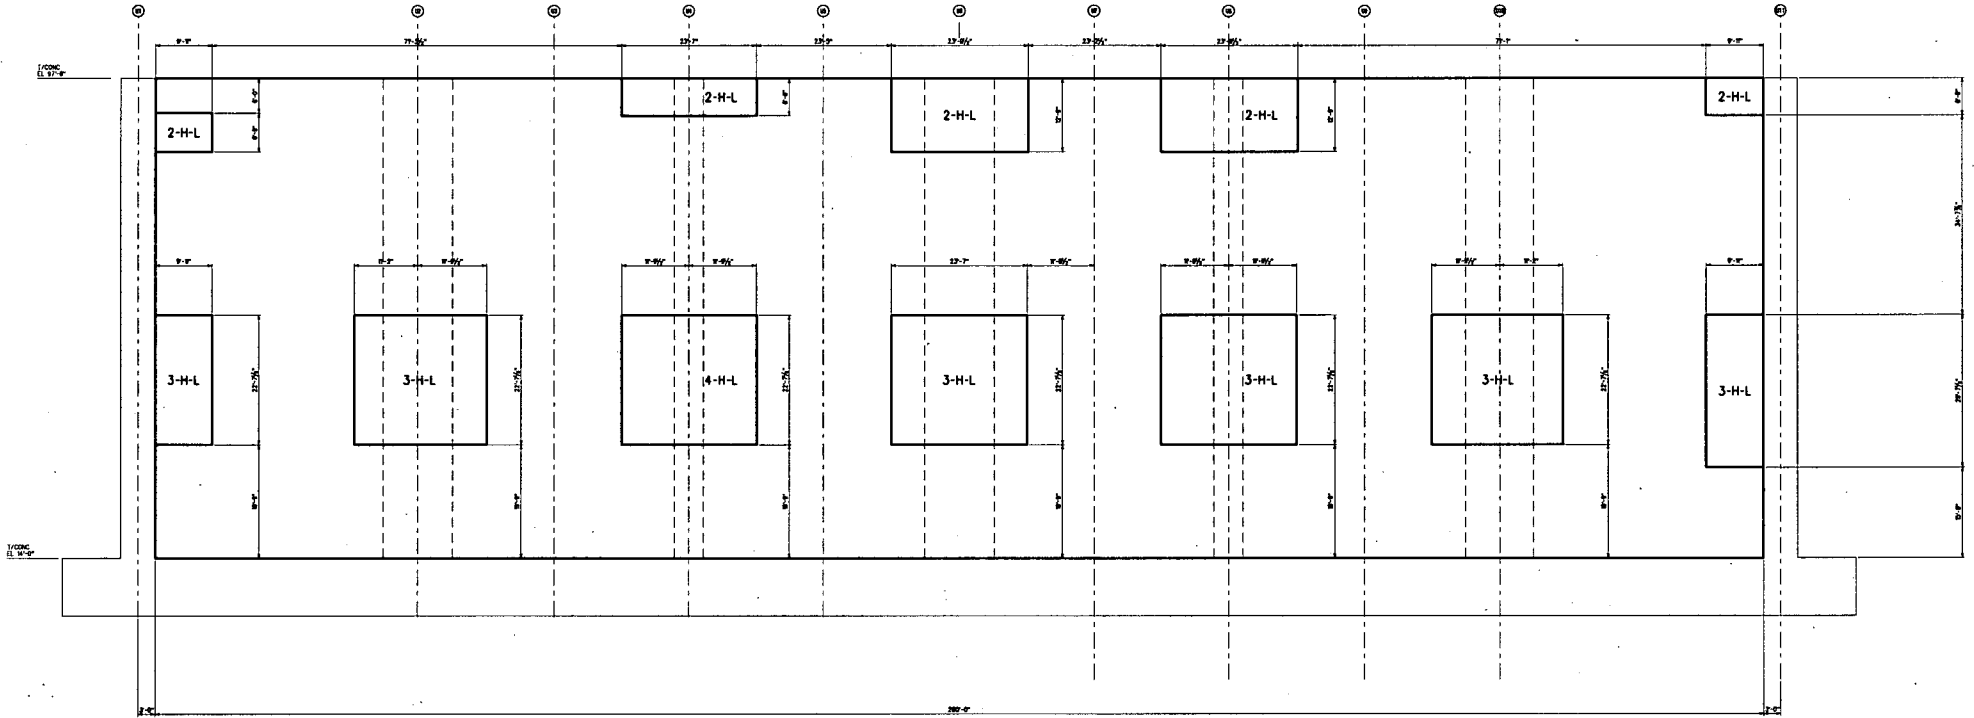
H.6-89: BASIN SOUTH WALL LOOKING NORTH
